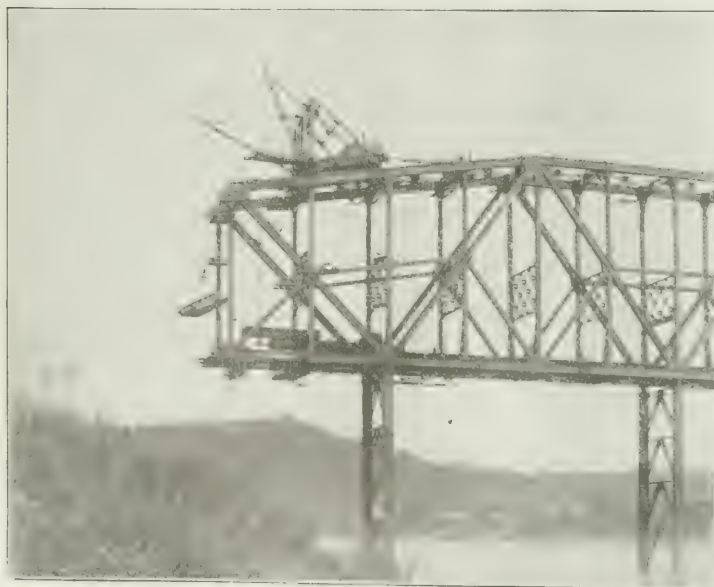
TWO BOOMS ON CHERRY TRAVELER SPEEDED UP THE SCIOTOVILLE BRIDGE PIER PILES.
